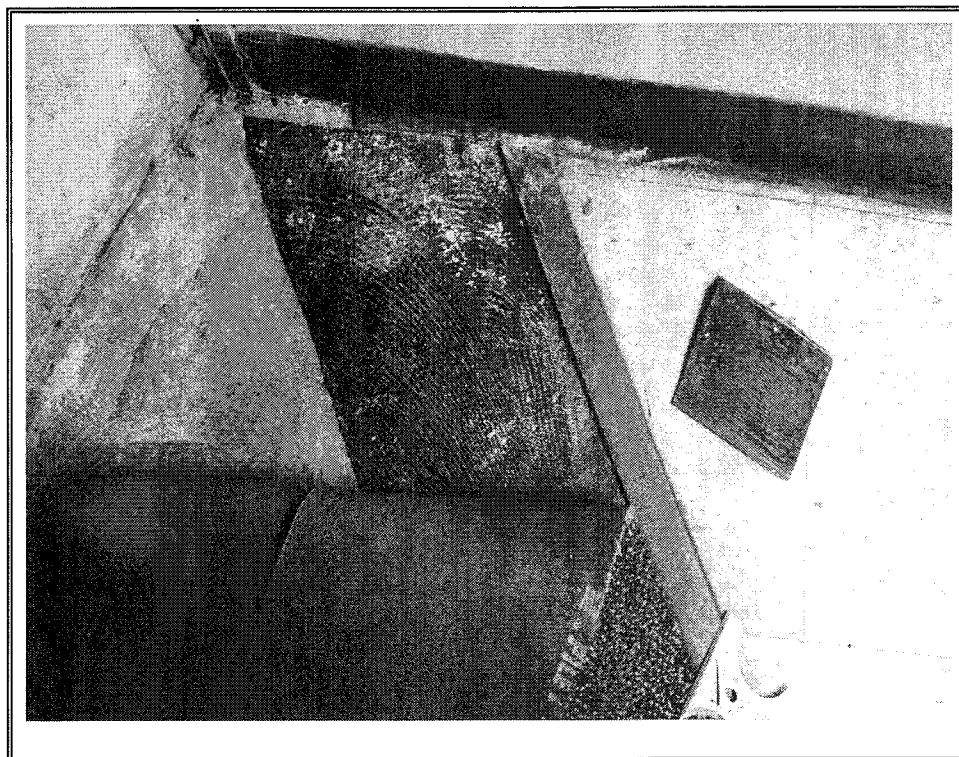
Wood Parquet Flooring in Dining Area.
